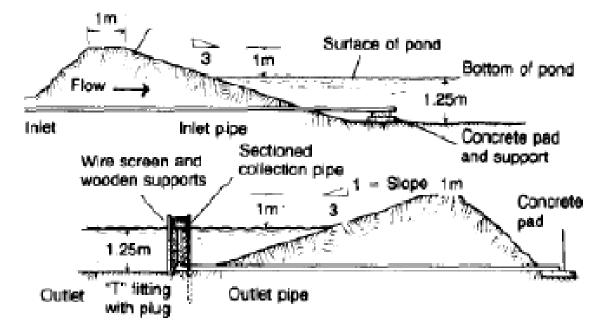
(B): Inlet and Outlet of an Oxidation pond
